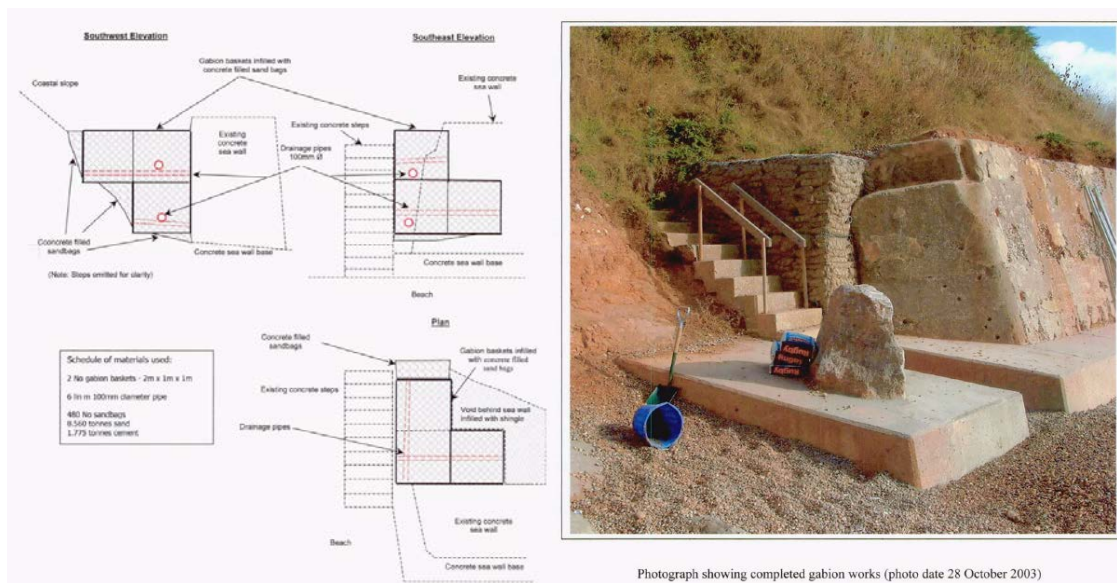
Side elevation plan of the emergency gabion works west of Check House Wall
